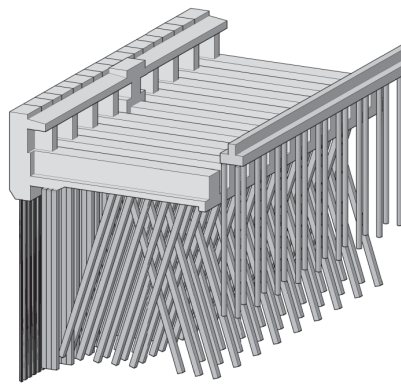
3D-figure of existing quay wall with all the piles and separate rear crane rail
